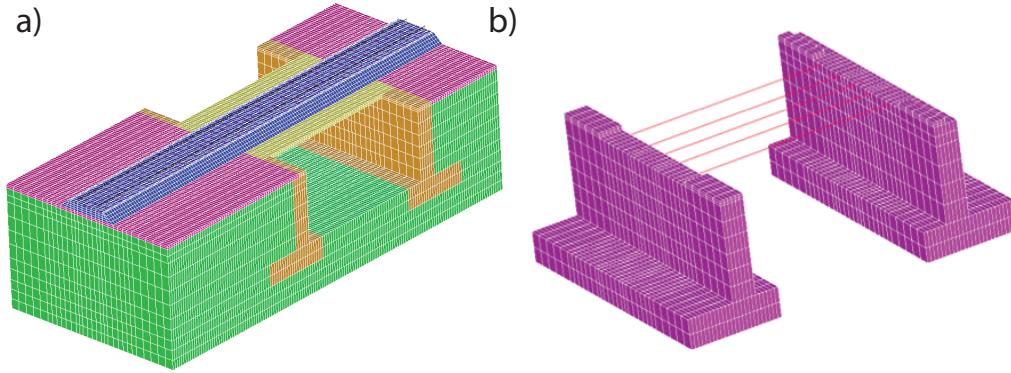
a) Full 3D Finite Element Model of the bridge approach. (Blue: Ballast, Red: Subballast, Green: Subgrade, Yellow: Deck, Orange: Abutment). b) Cutaway showing the beams under the bridge.
